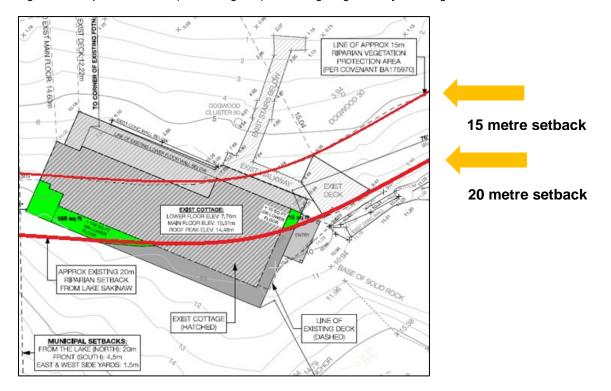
Proposed Addition (shown in green) to existing Single Family Dwelling under DVP00026
